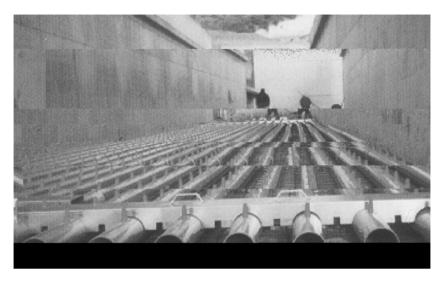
Sample of a tunnel with spicket floor (WTT, 2000).
